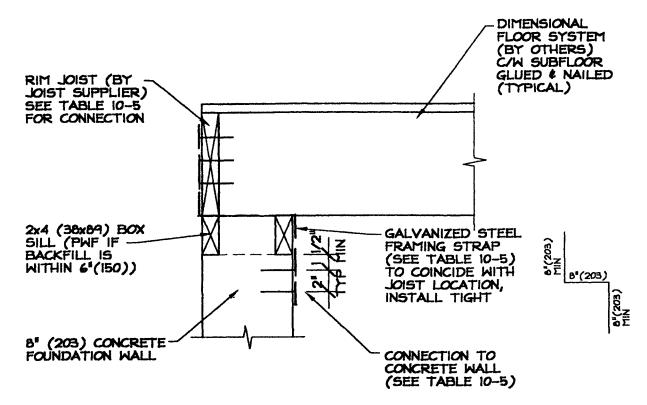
B - LATERAL BRACING, SIDEWALL CONDITION (DIMENSIONAL LUMBER SYSTEM)
